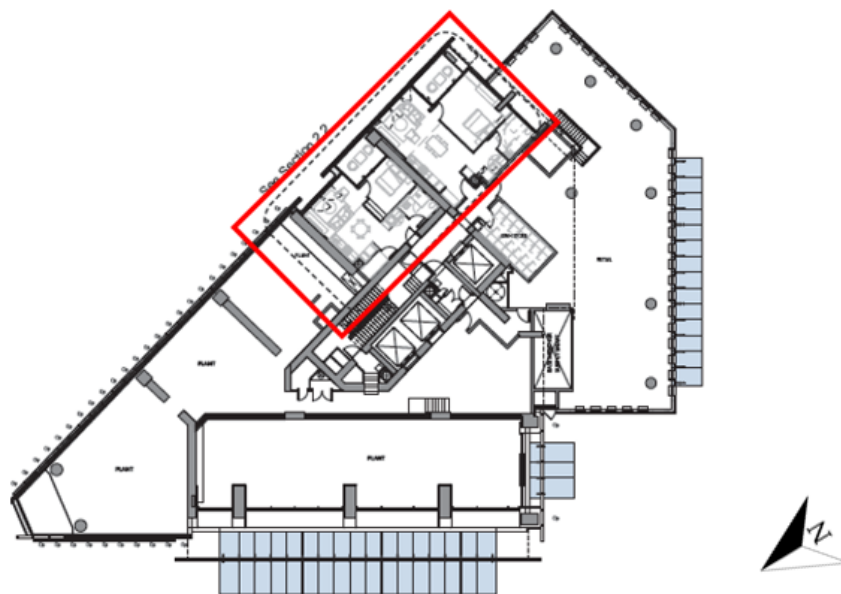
| Proposed key worker housing (in red) on Level PO1 (Base source: Applicant's Design Report)
